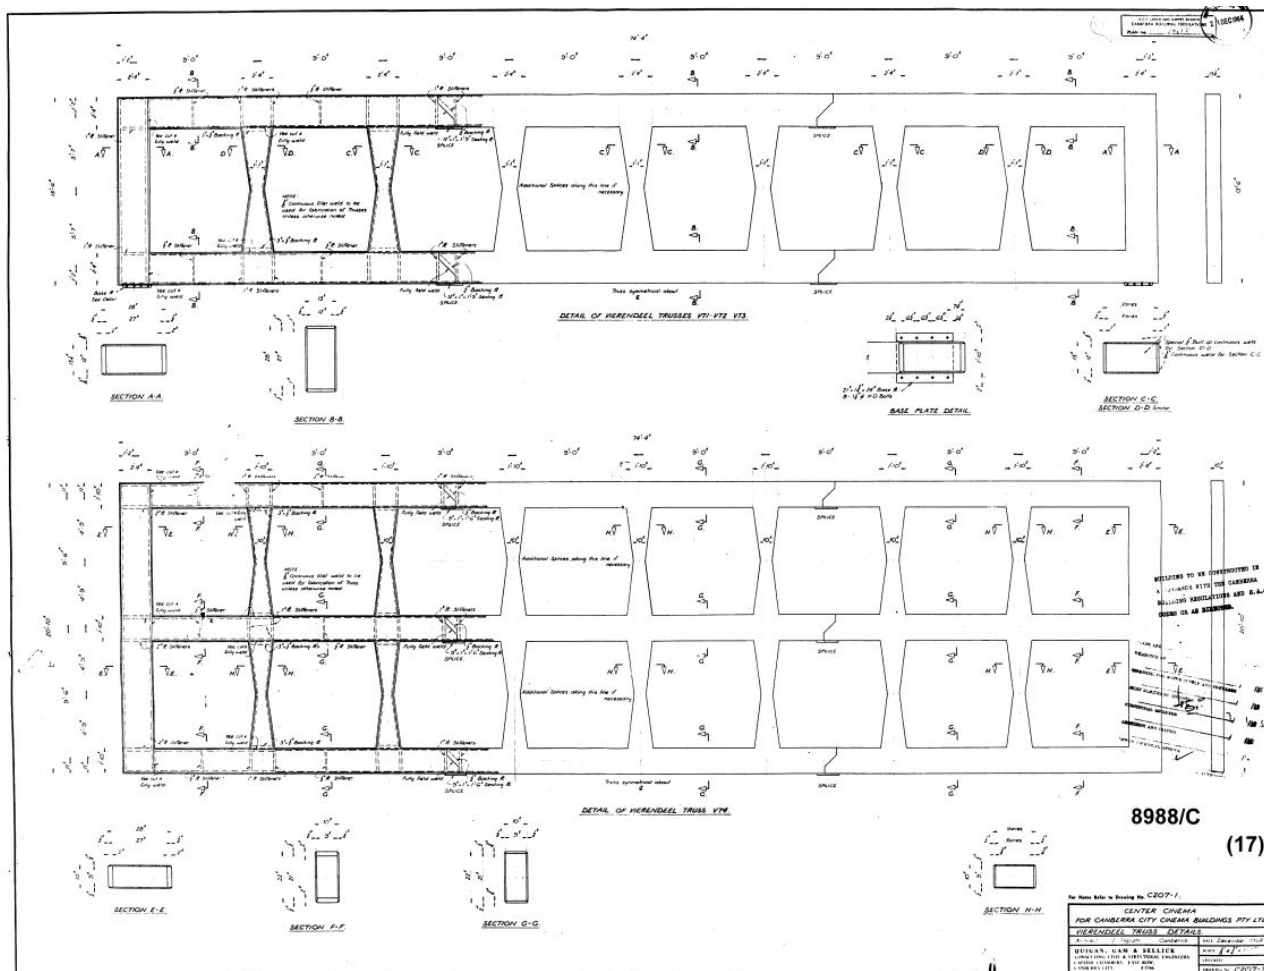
Structural engineer’s drawings Vierendeel Trusses – K Sellick 1965
